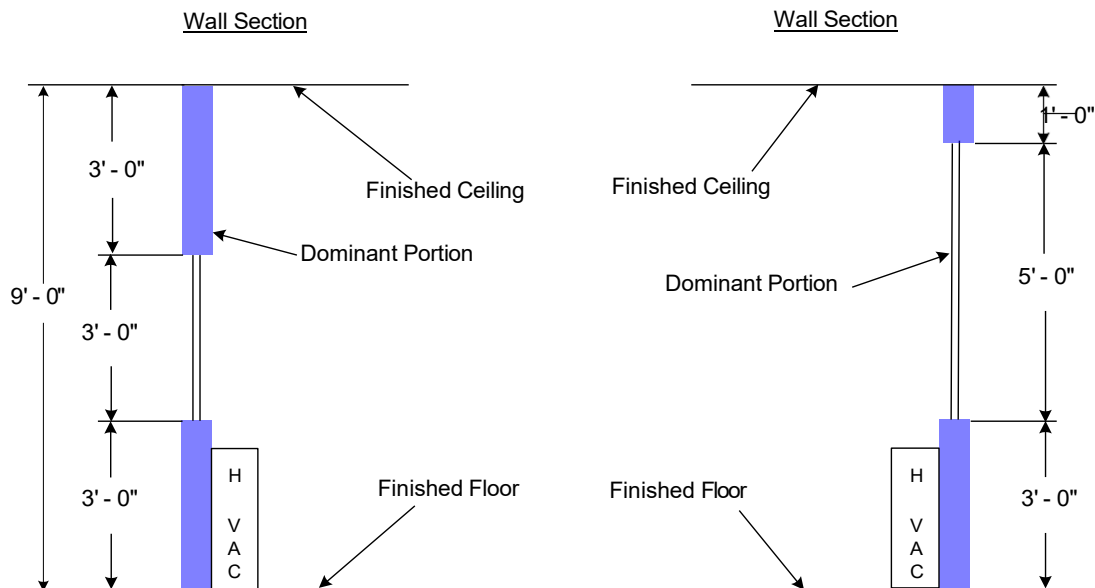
If no finished surface of the permanent, outer building wall is 50% or more of the vertical floor-to-ceiling dimension (as shown in the left diagram), or if the permanent, outer building wall is not vertical, the Dominant Portion is the inside, finished surface of the wall where the wall intersects the finished floor (as shown in the right diagram).
